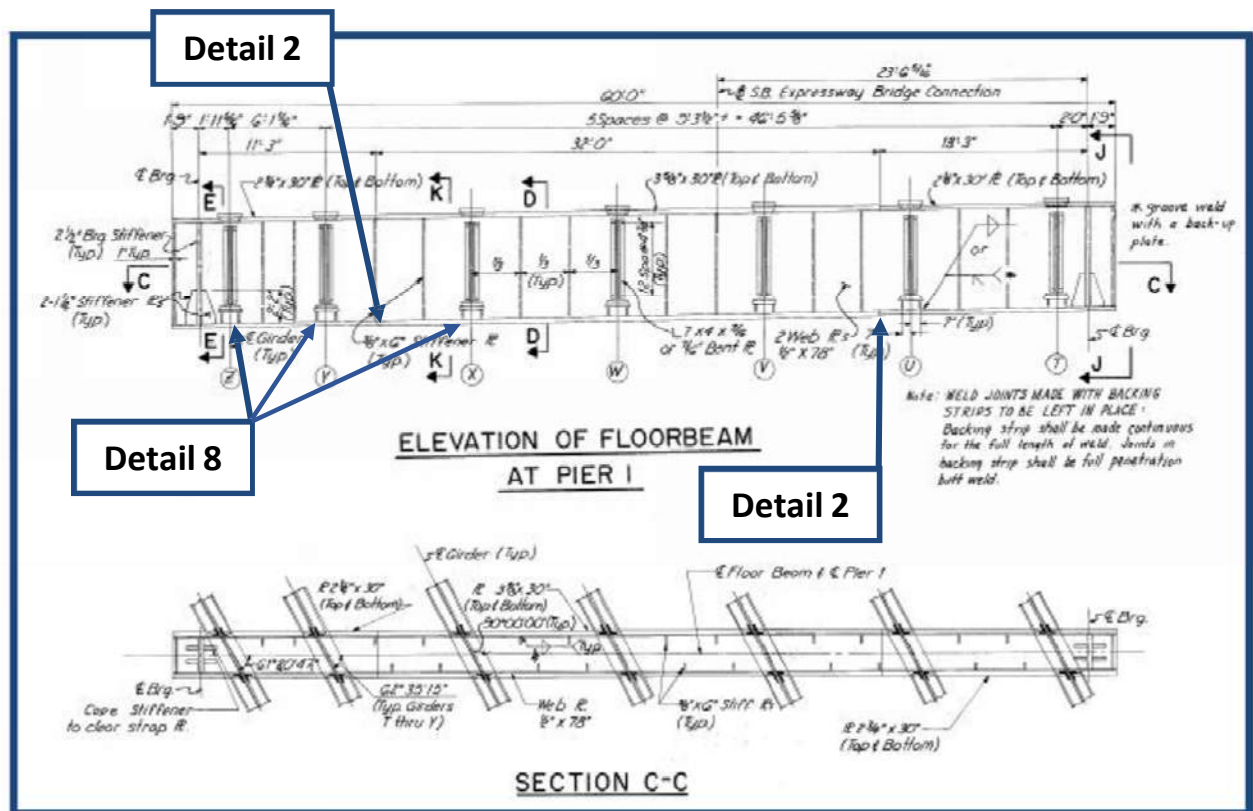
Plan and Elevation of Pier Cap 1 with Fatigue Prone Details.
